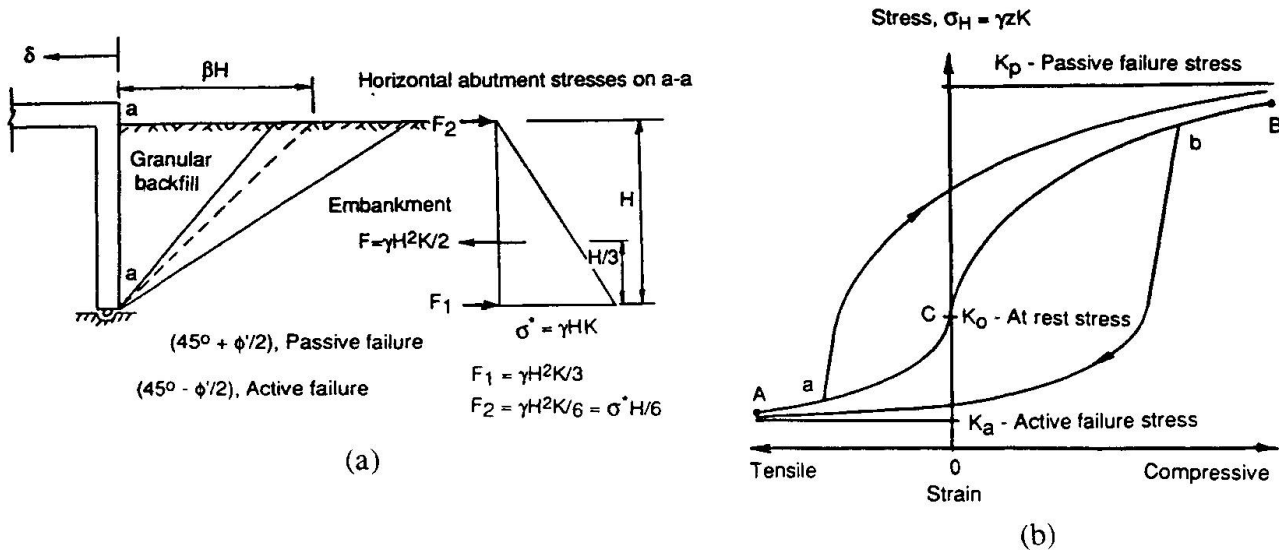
(a) Lateral soil pressure on a retaining wall type bridge abutment
